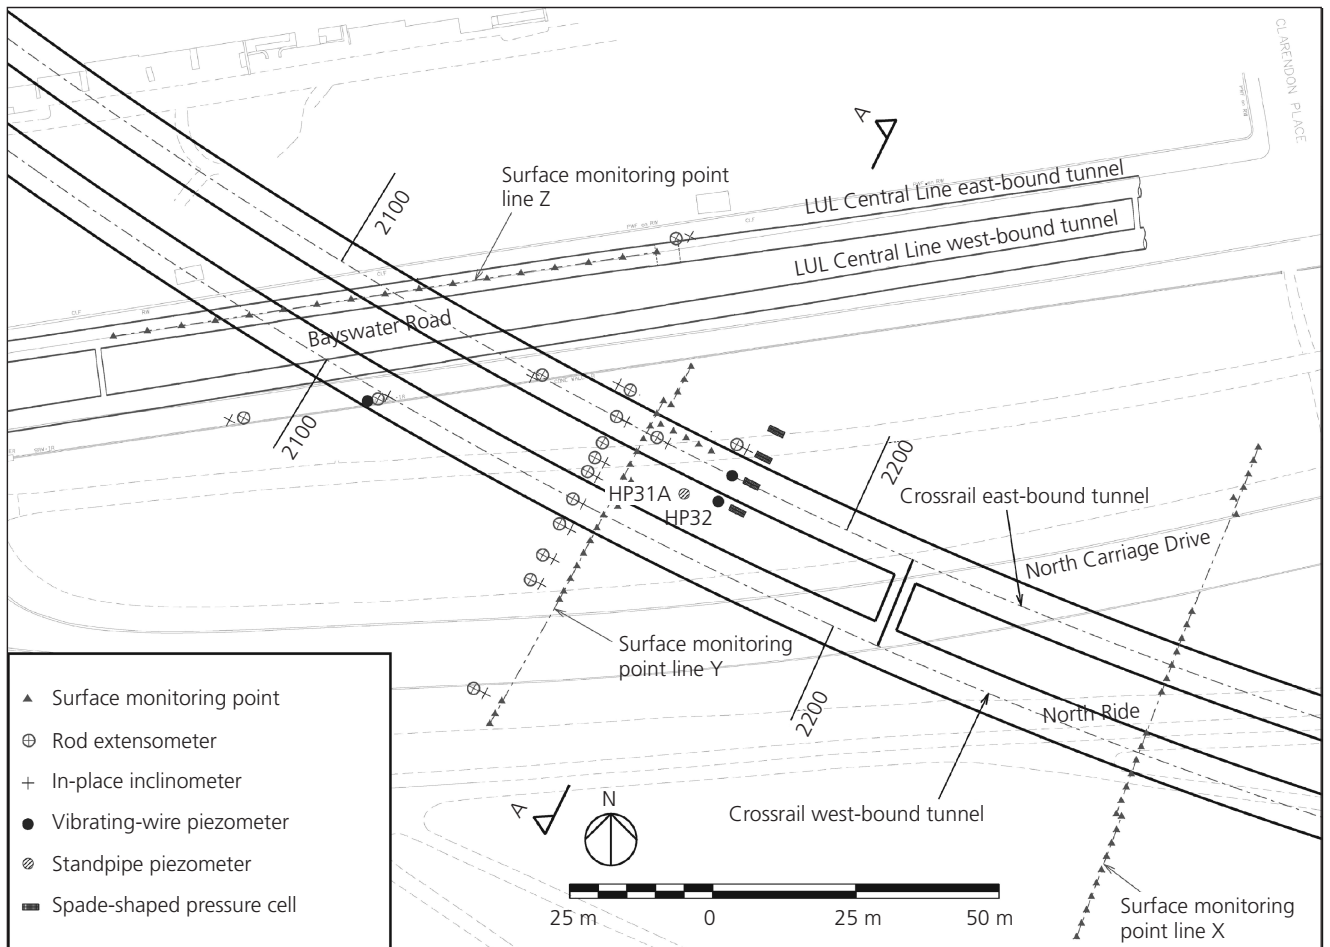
Plan of instrumentation in Hyde Park and Bayswater Road
